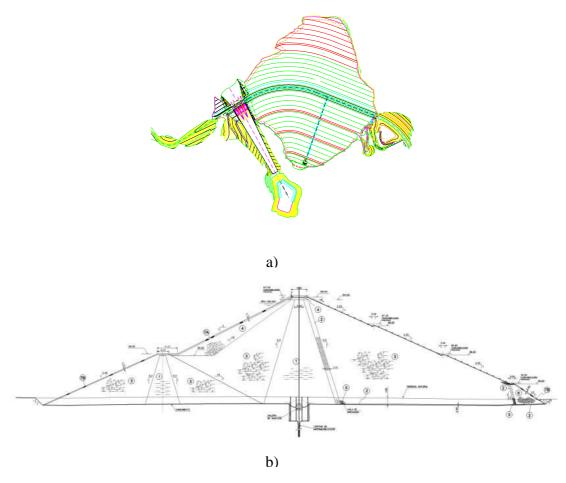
a) Odelouca dam plant. b) Odelouca dam cross-section.
